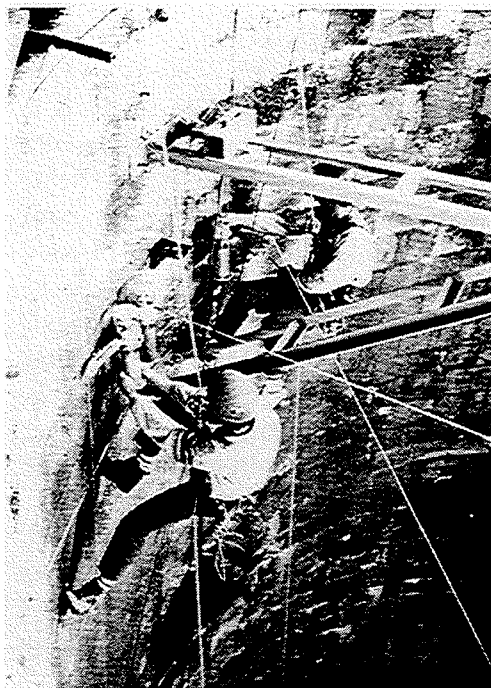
Installation of long-base extensometers on the internal wall of the Pisa tower.
